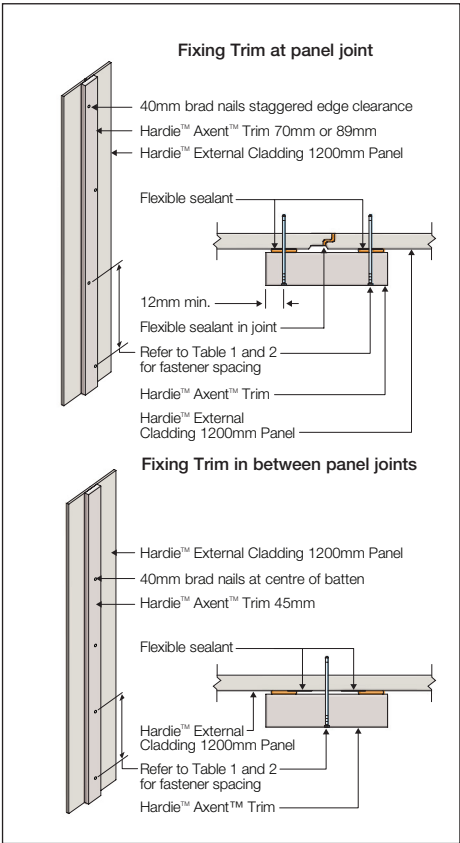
BATTEN ON PANEL JOINTING DETAIL
